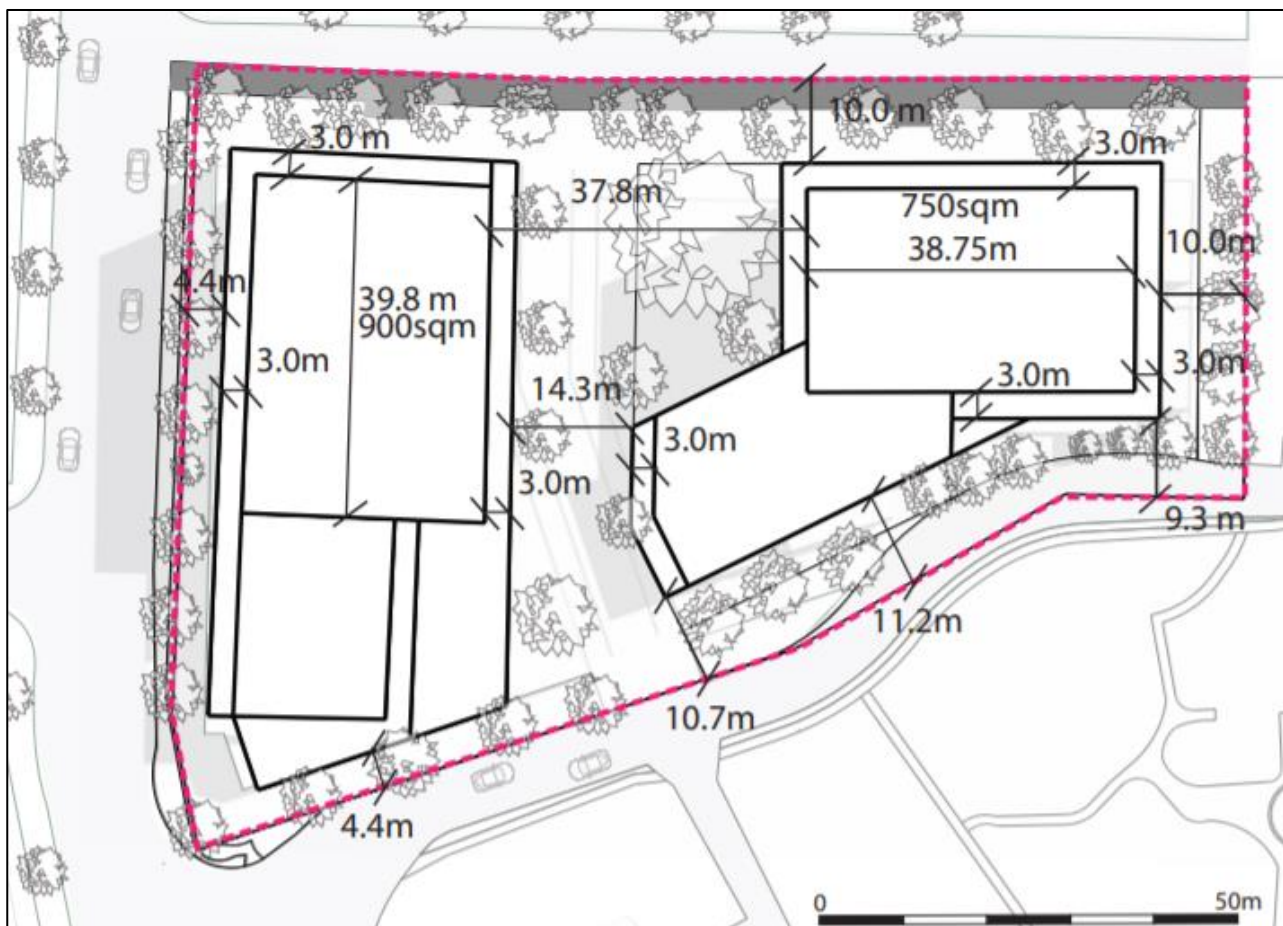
Setbacks for 93 Bridge Road, Westmead (Roberts Day 2020)
